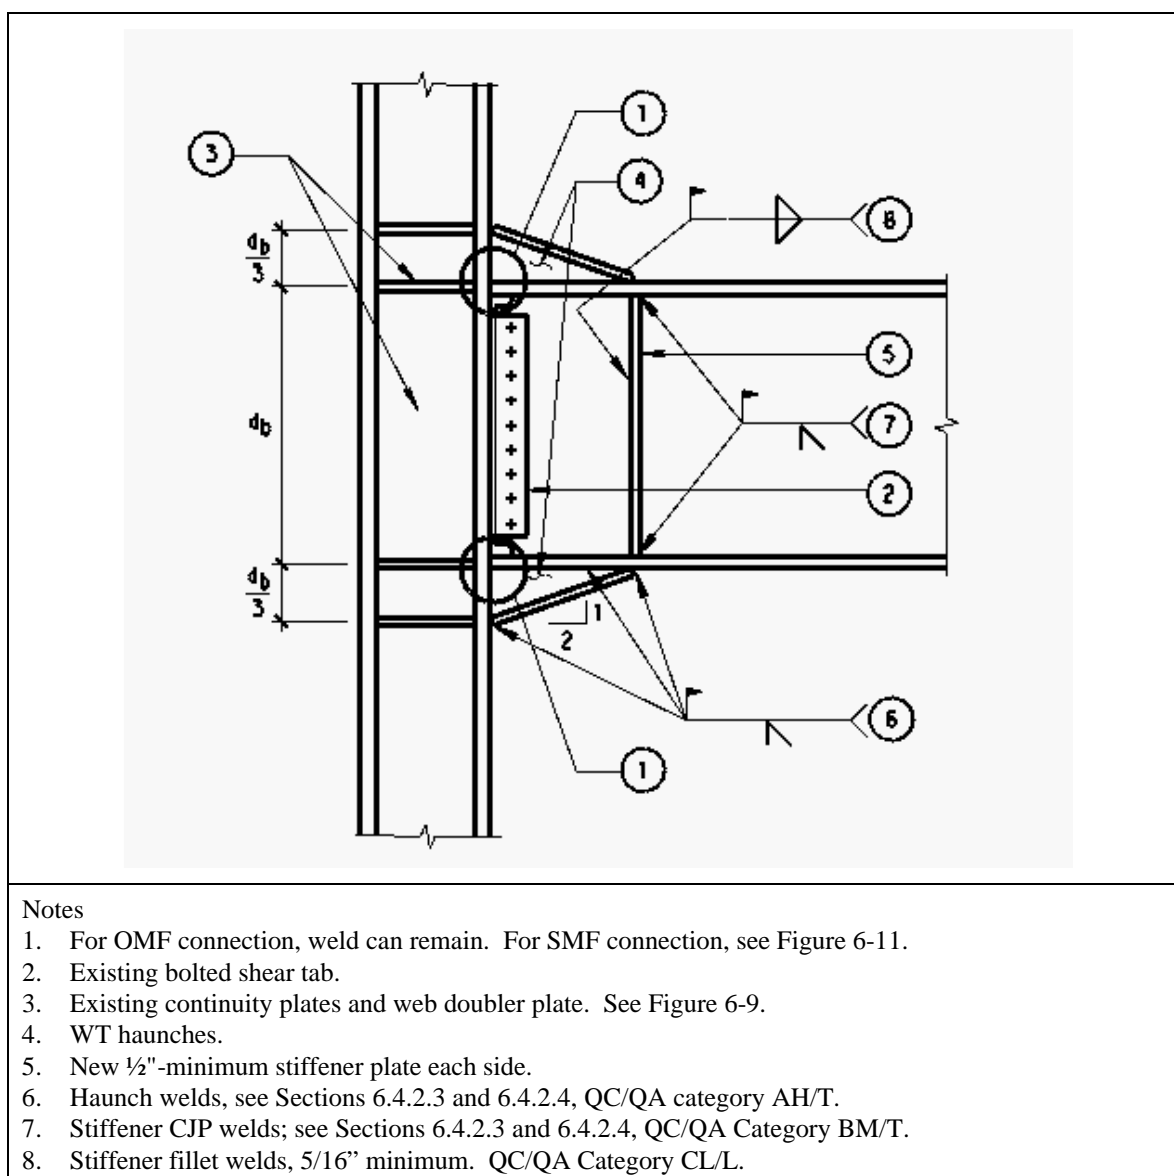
Welded Top and Bottom Haunch (WTBH) Connection
